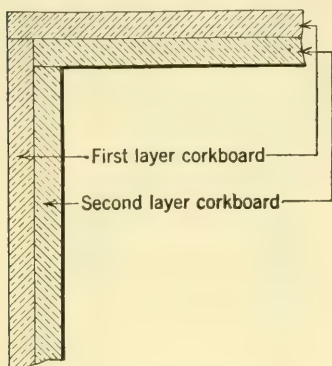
Insulation—Joint at Wall and Ceiling.
